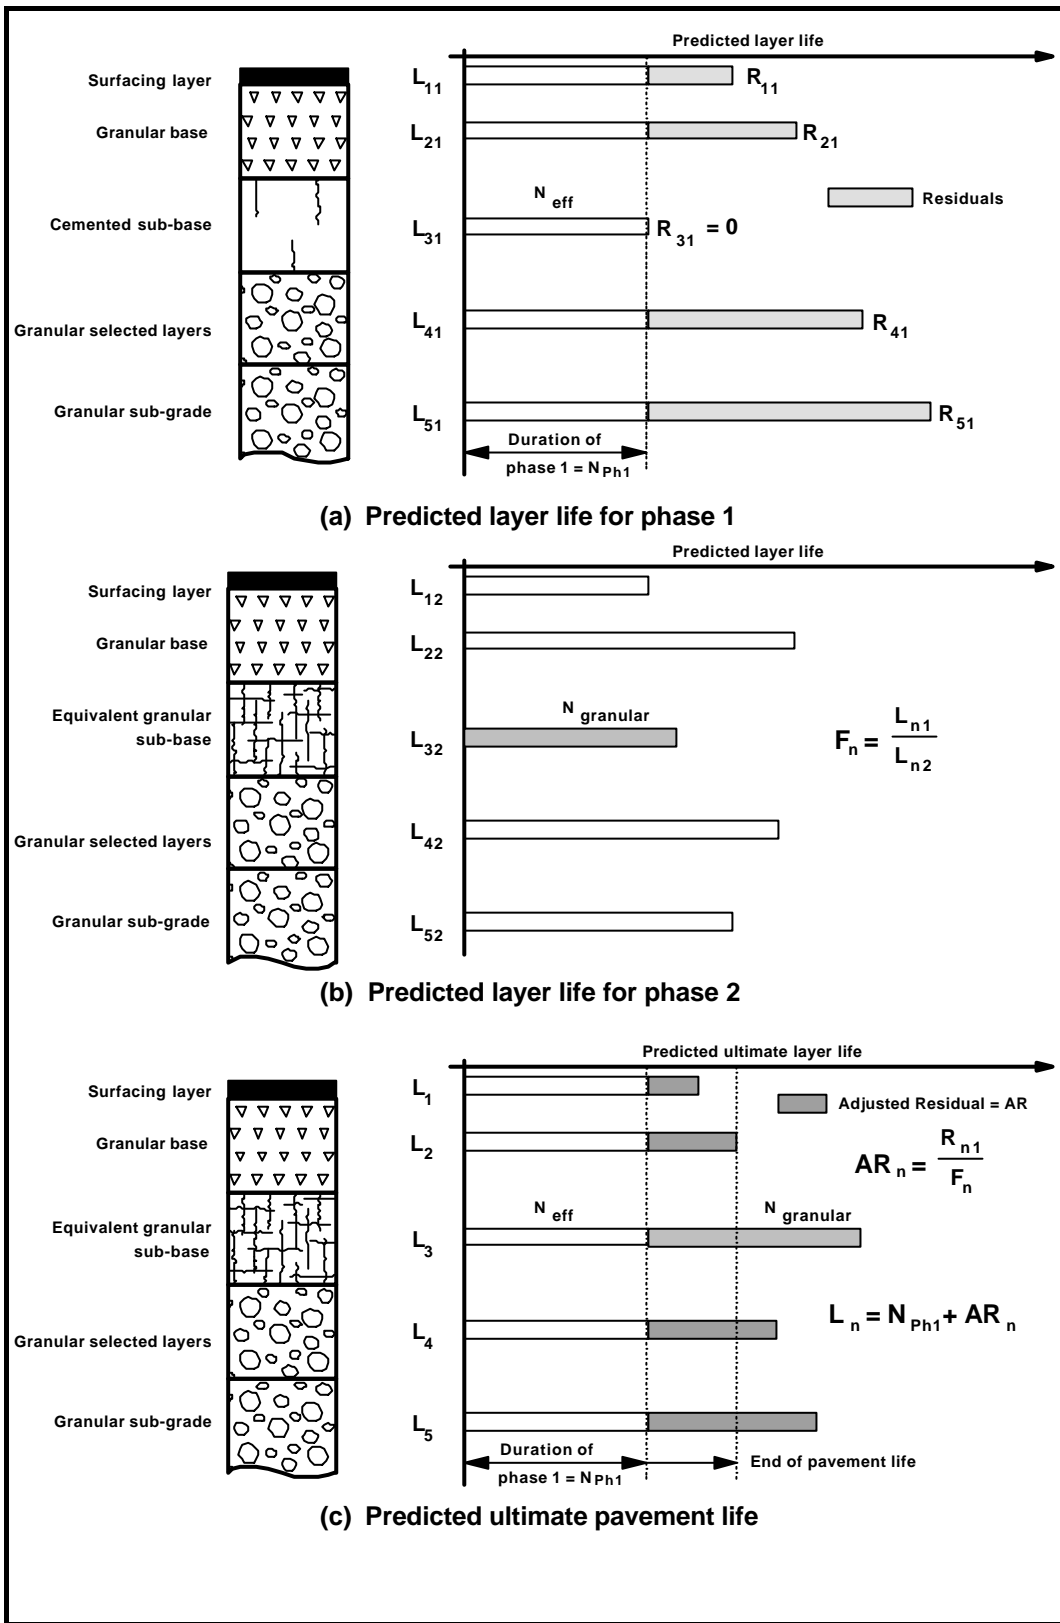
Calculating the ultimate pavement life for a pavement structure with cemented layers
